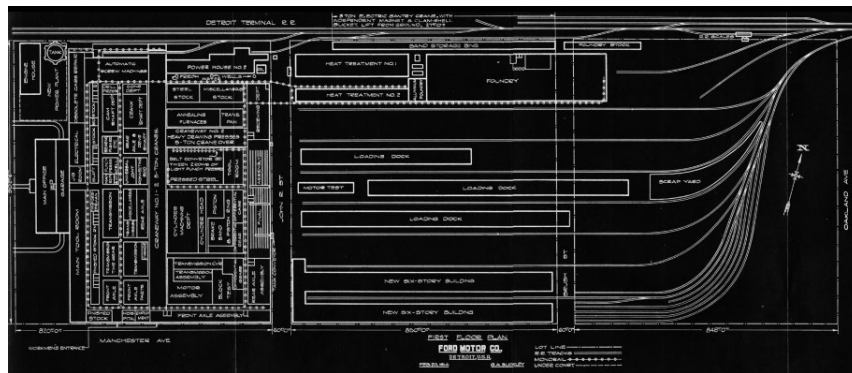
Albert Kahn: Ford Highland Park Plant, General Layout, Detroit, 1914
